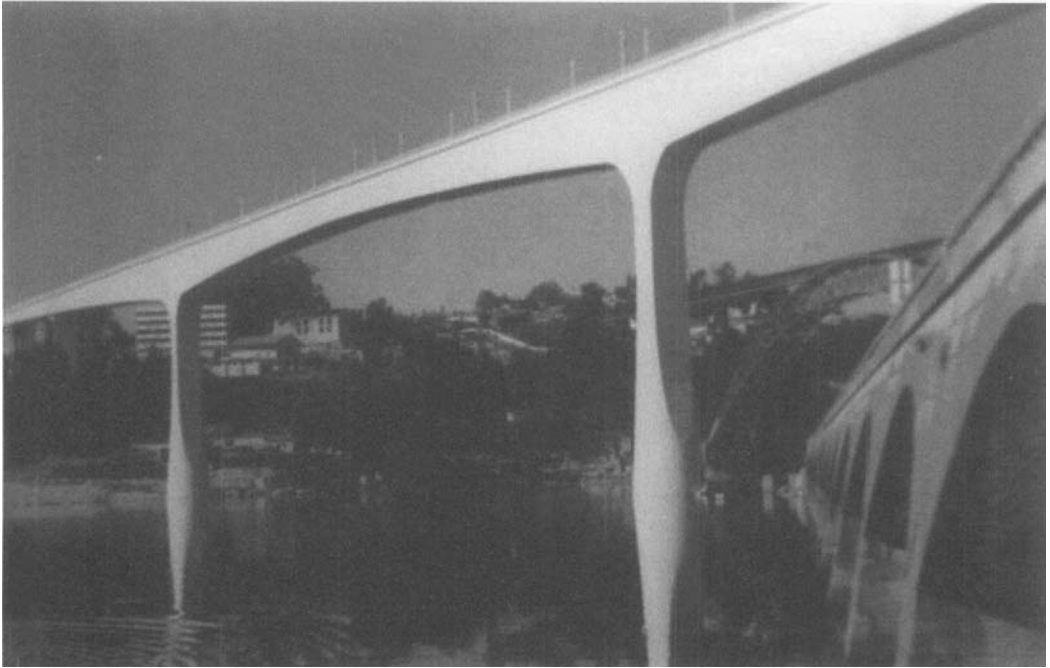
S. João Bridge in Porto, Portugal, the longest concrete box girder span for railway bridges (250 m)
